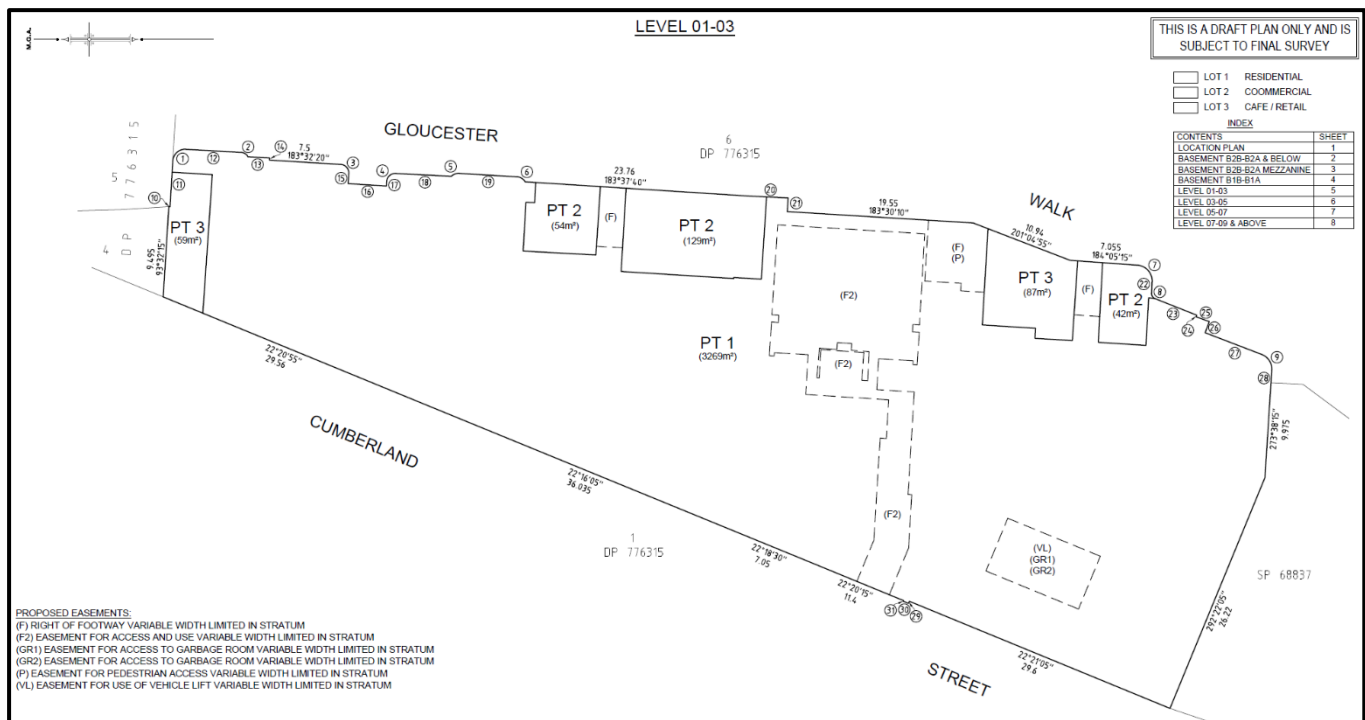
| Levels 1 – 3 (source: Applicant's proposed plans)
